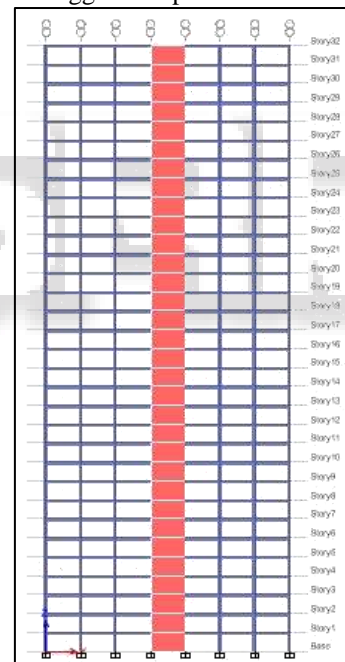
Sectional Elevation of Building Model 1 (Without Outrigger)
